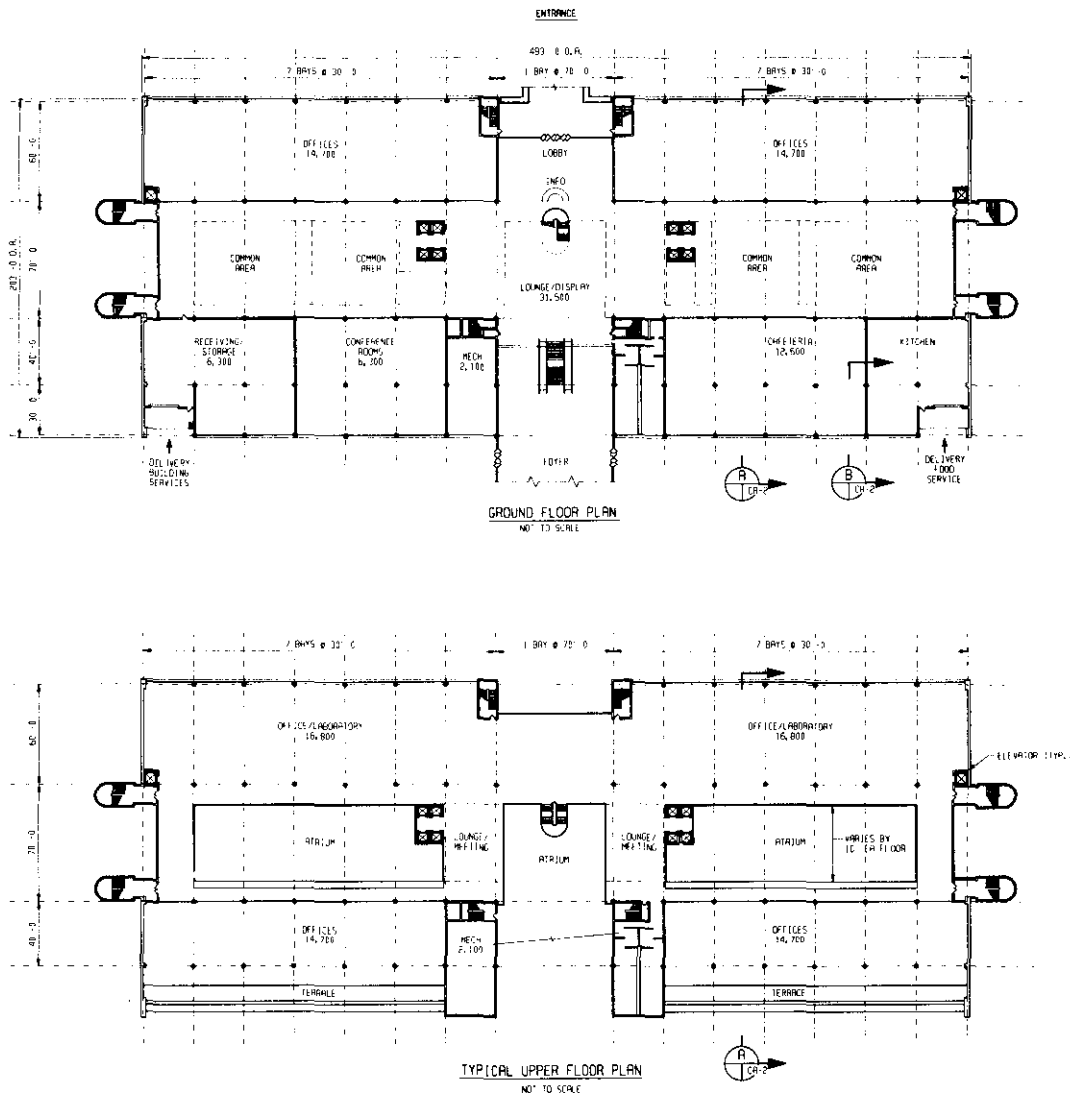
Floor plan of a typical storey of the Central Laboratory Building.
